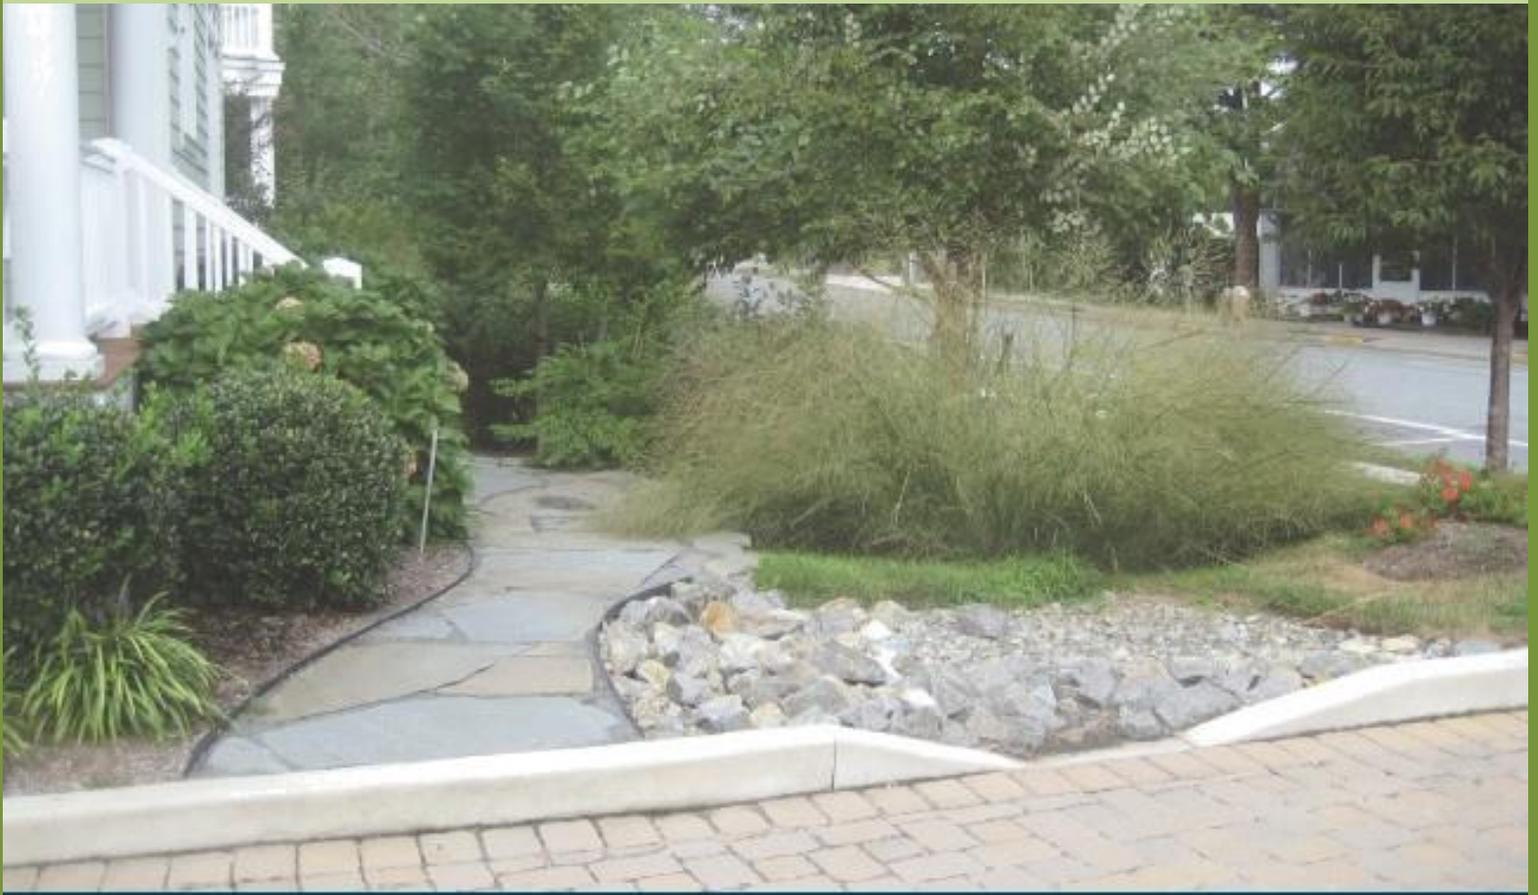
Concrete Apron and Depressed Curb Provided at Maintenance Access
